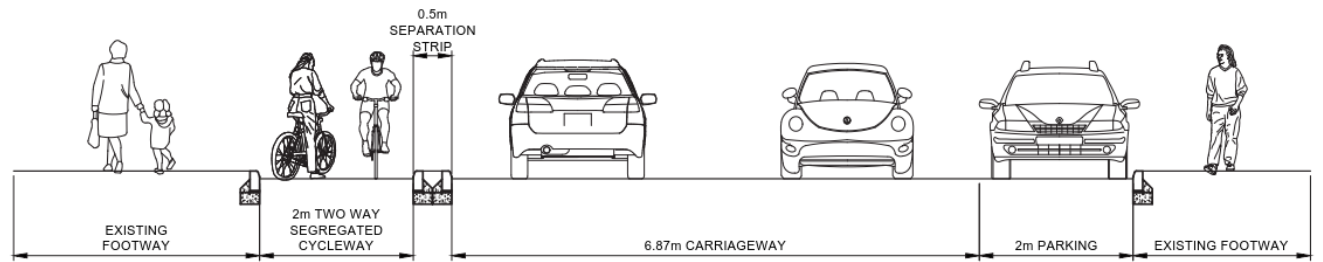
Cross Section Route 1 - High Street, Shorthope Street to Millhill
